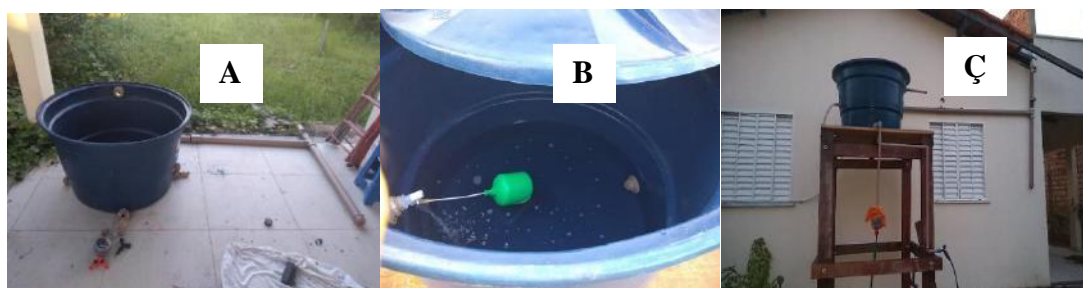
A - provided positioning holes and connections; B- float switch positioned at the midpoint of the height of the water tank; C- complete system.
